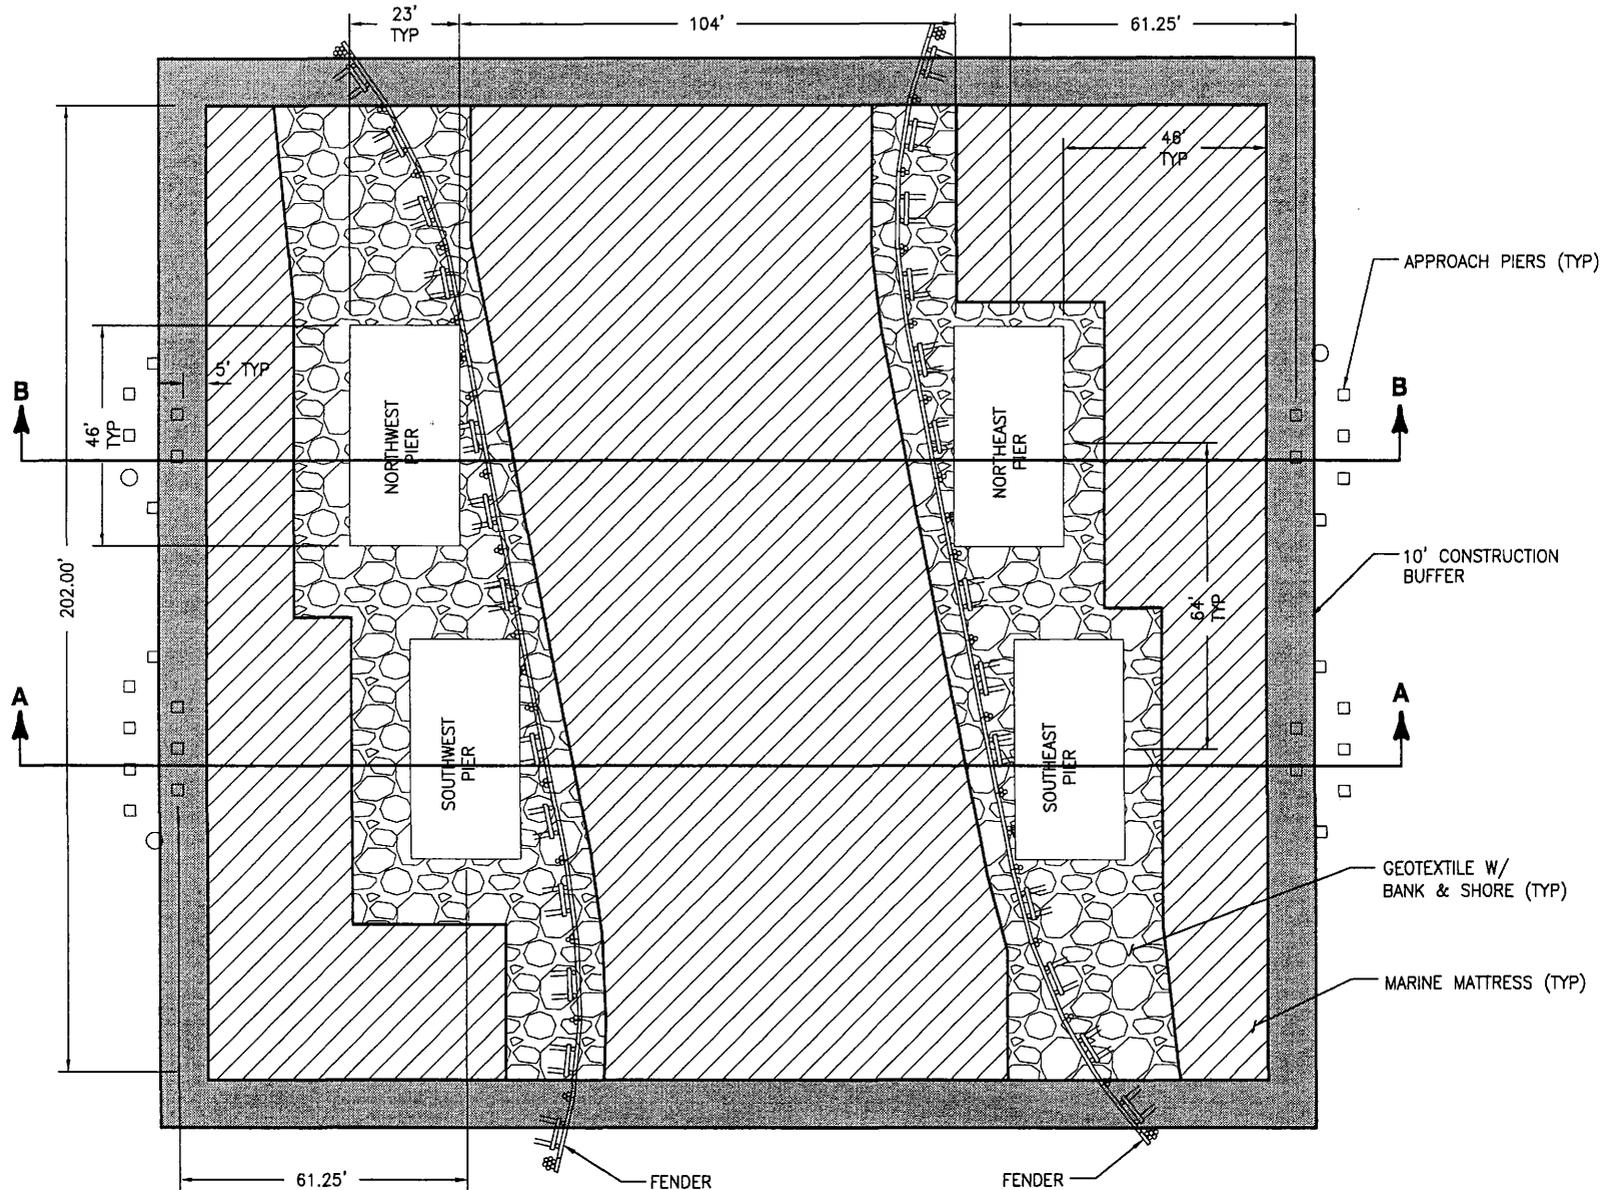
A INDIAN RIVER BRIDGE FINISHED DREDGING ELEVATIONS
